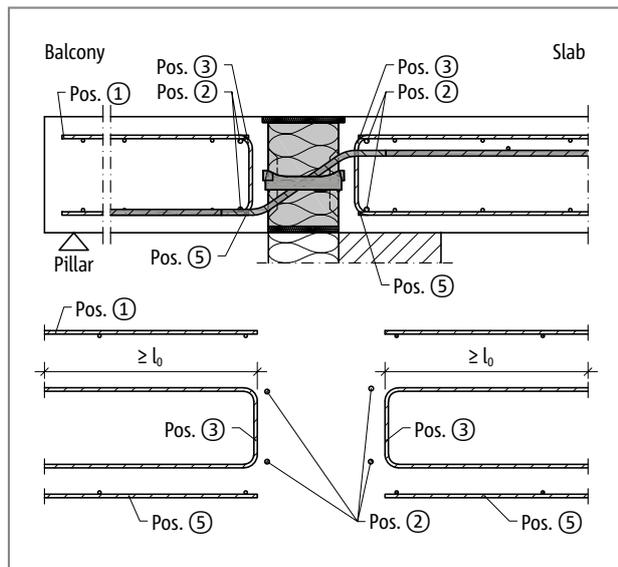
Schöck Isokorb® XT type Q-V5 to Q-V8: On-site reinforcement
